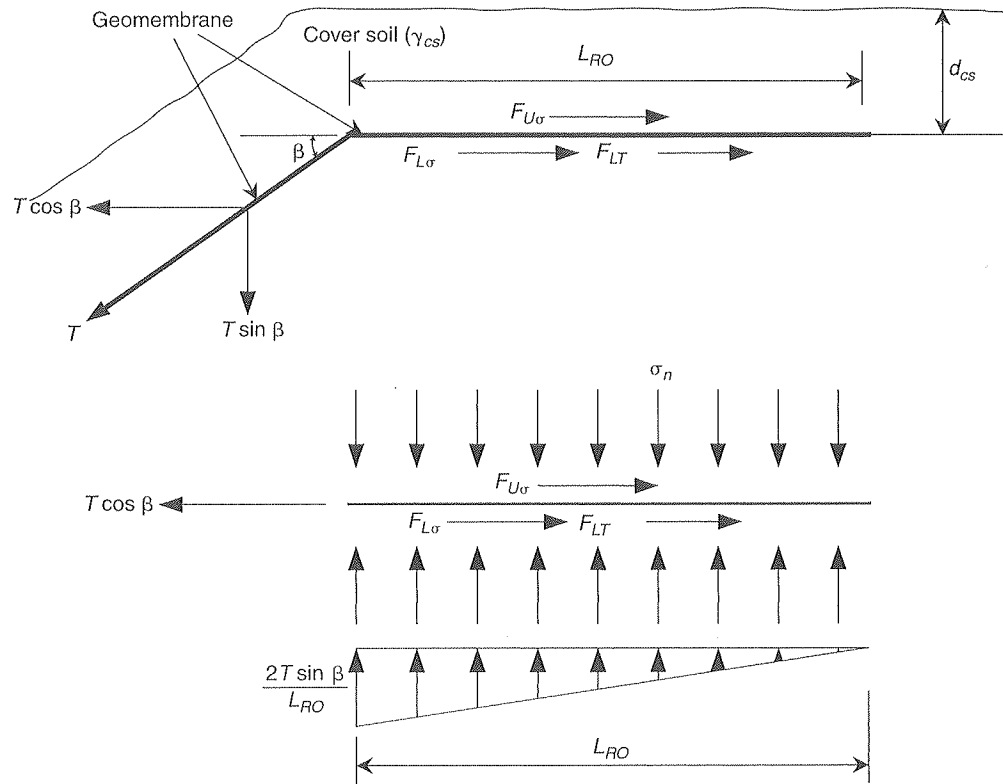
Cross section of geomembrane runout section and related stresses and forces involved.
